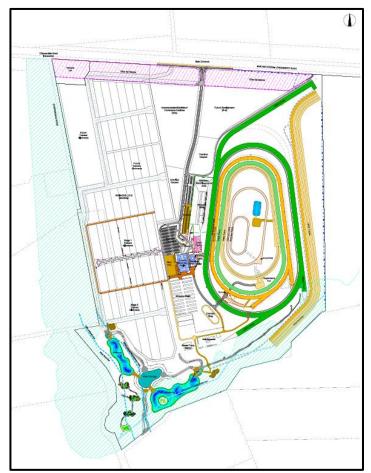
Pakenham Racecourse – Stormwater Master plan
